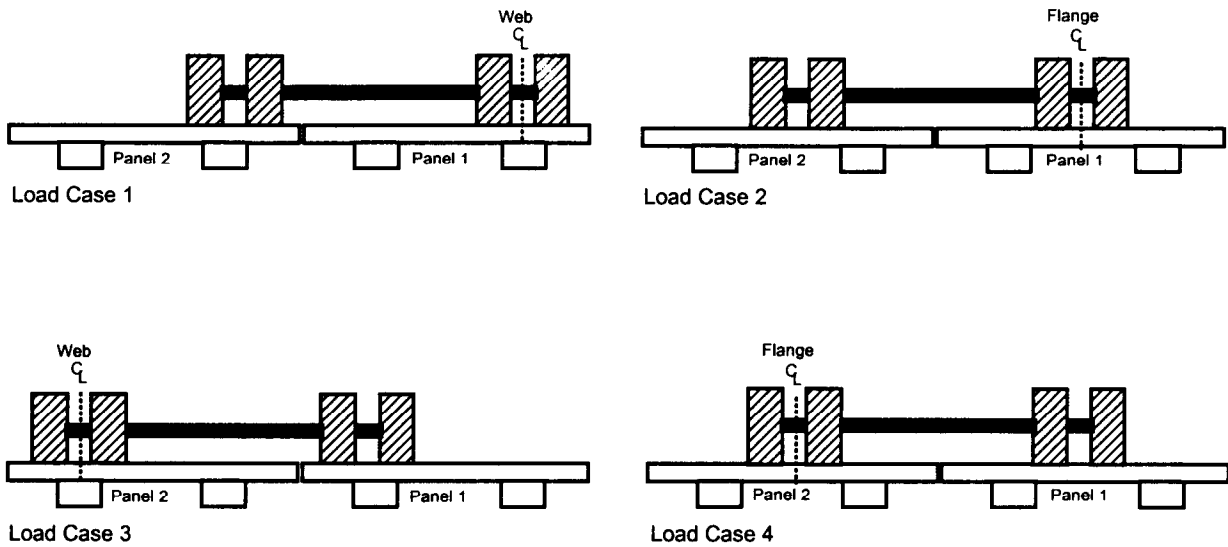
Transverse load positions (looking north) and deck panel numbers for the load test of the Georgia Pacific bridge. For all load cases, the two rear axles were centered over the bridge centerspan.
